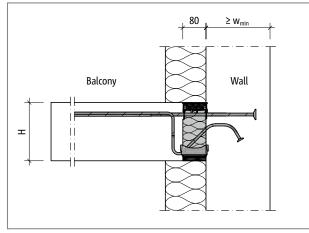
Schöck Isokorb® T type K-U: Wall connection upwards with external insulation
